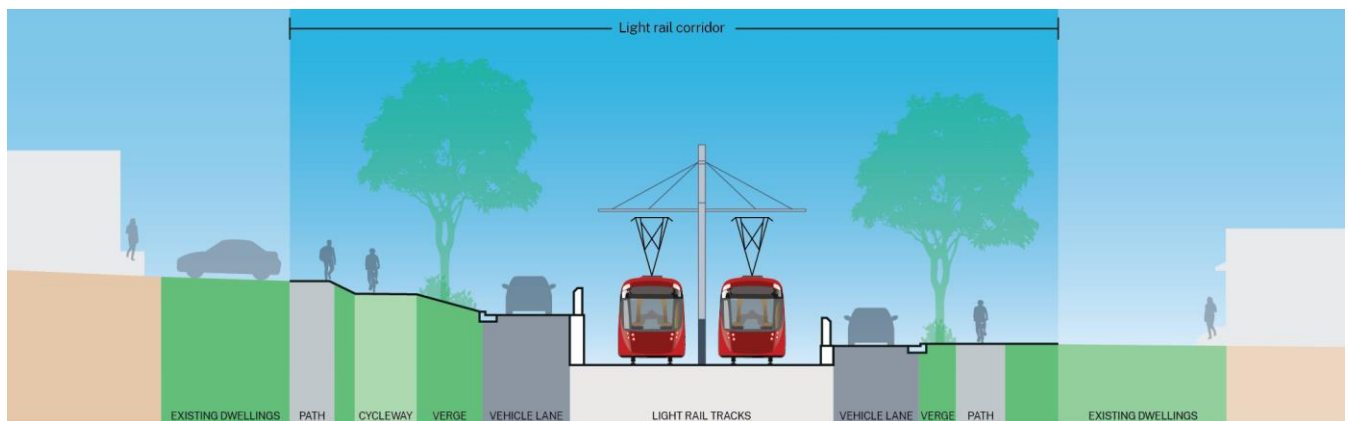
Indicative cross section showing retaining walls at Boronia Street
